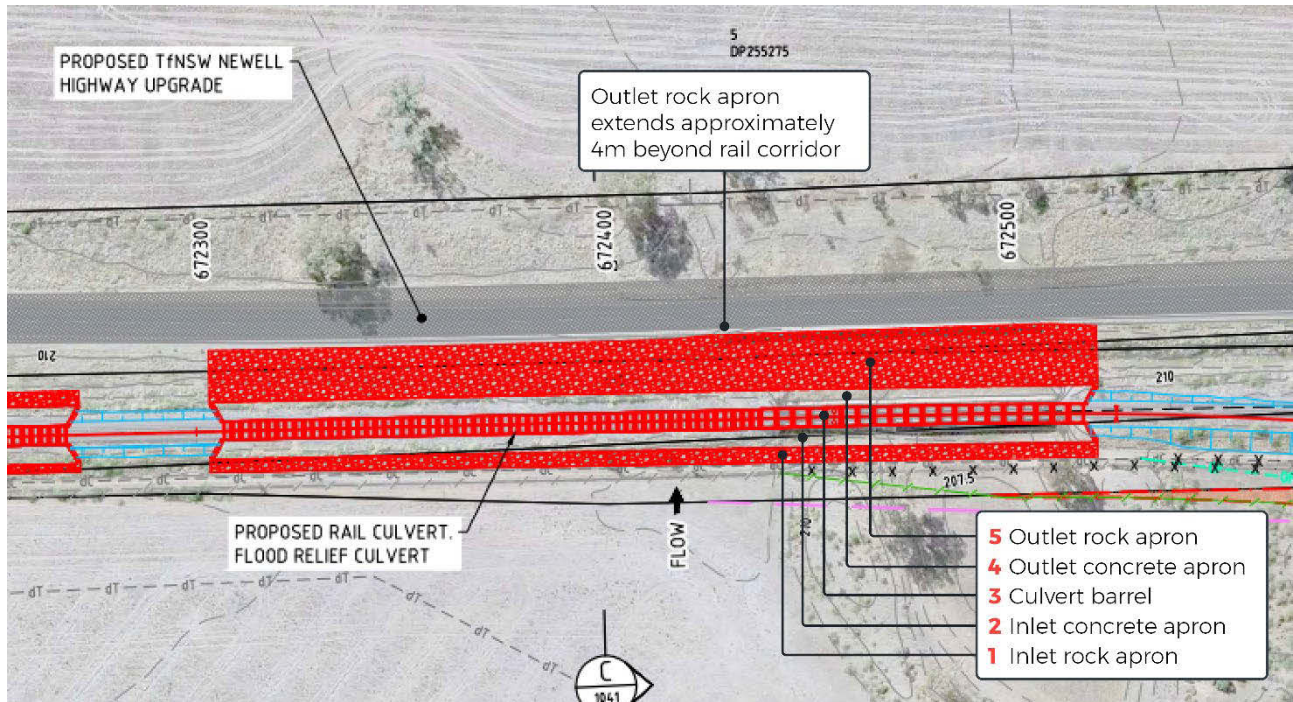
Example of rock apron for culvert scour protection extending beyond the rail corridor
